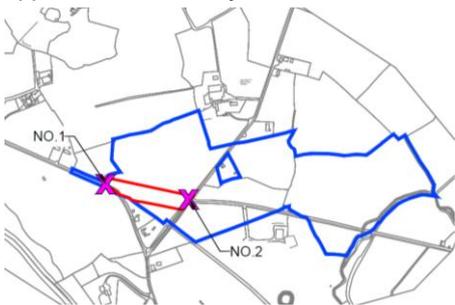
Extract from the planning drawings showing the Tullovin Temp Access track
